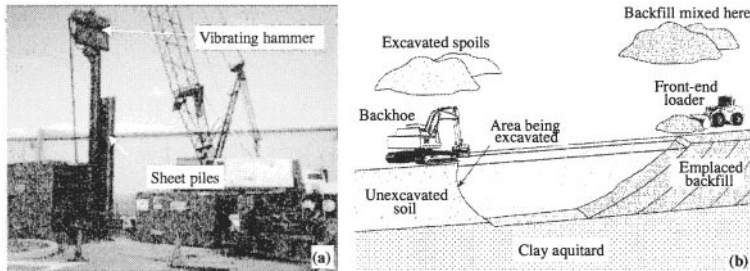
(a) Emplacement of sheet piles using a vibrating hammer and (b) schematic diagram indicating the installation of soil-bentonite slurry trench (excavation and backfilling) (adapted from Gavaskar et al. 2000, <<http://www.itrcweb.org/Documents/PRB-2b.pdf>>)
